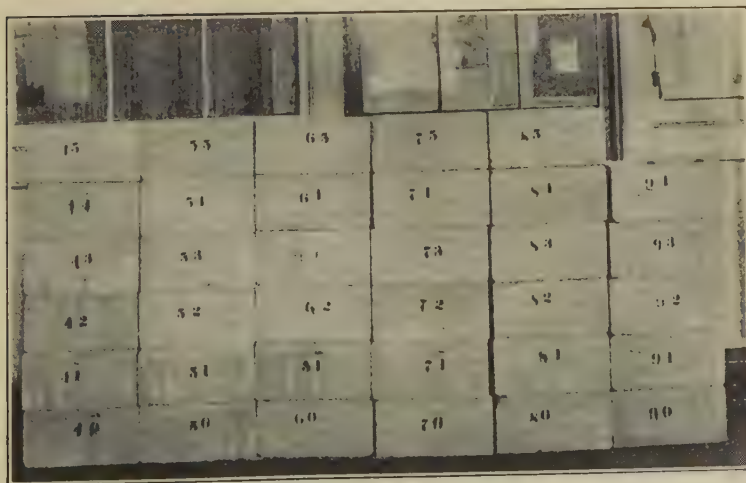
ASSEMBLED BLOCKS MADE AT NORTHWEST DAVENPORT
